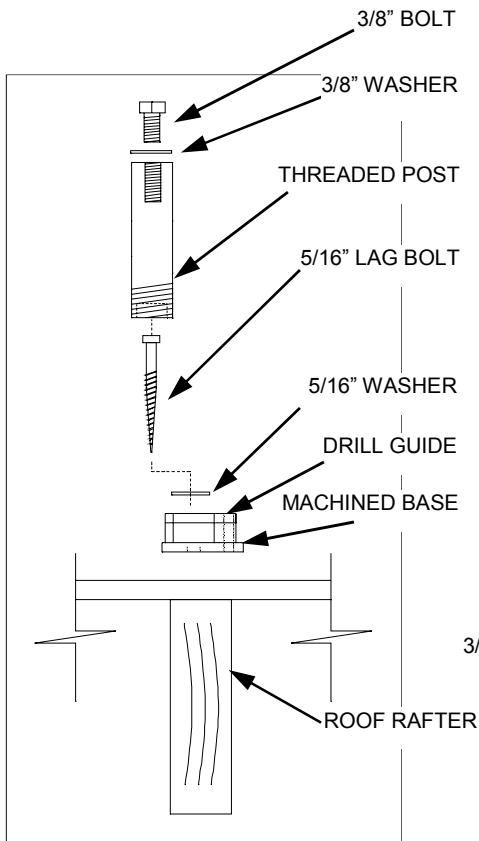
FASTJACK® base is installed over the roof rafter and sheathing.
